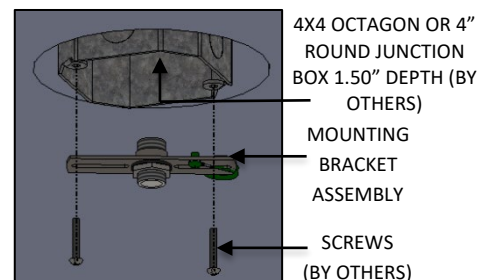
MOUNTING BRACKET ASSEMBLY INSTALLATION
